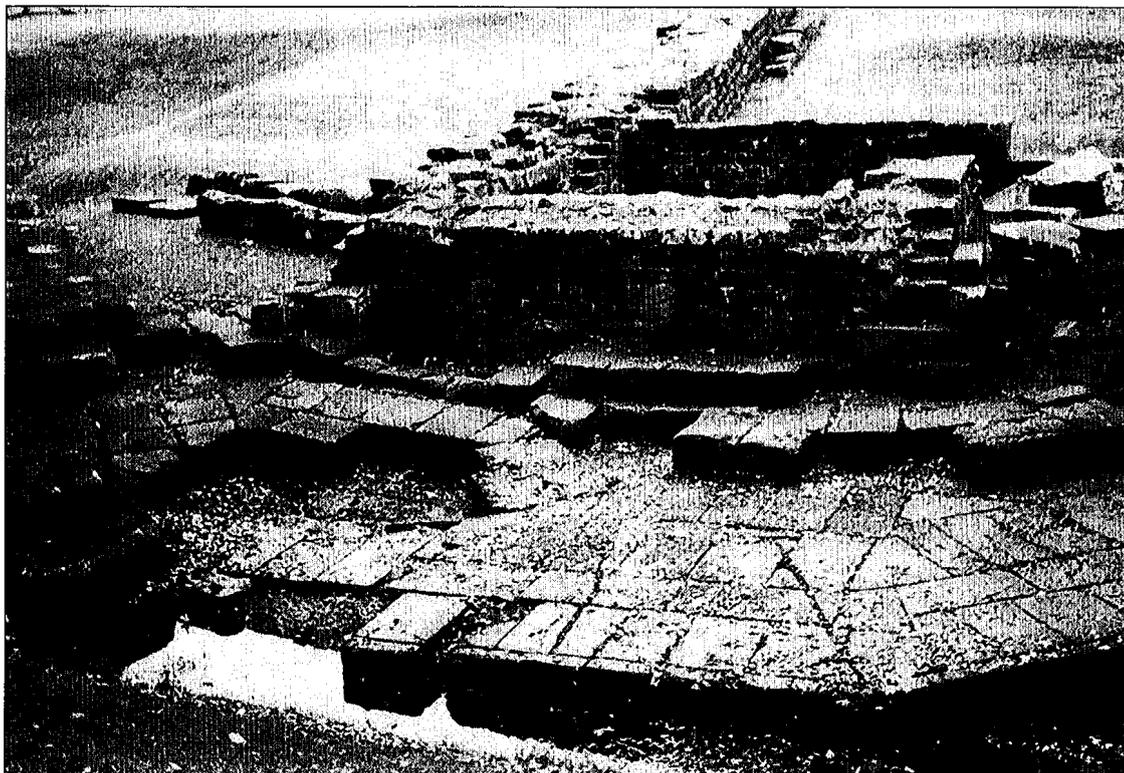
Bridge foundation from Hadrian's Wall at Chesters, England, from O'Connor (Ref. 18).
